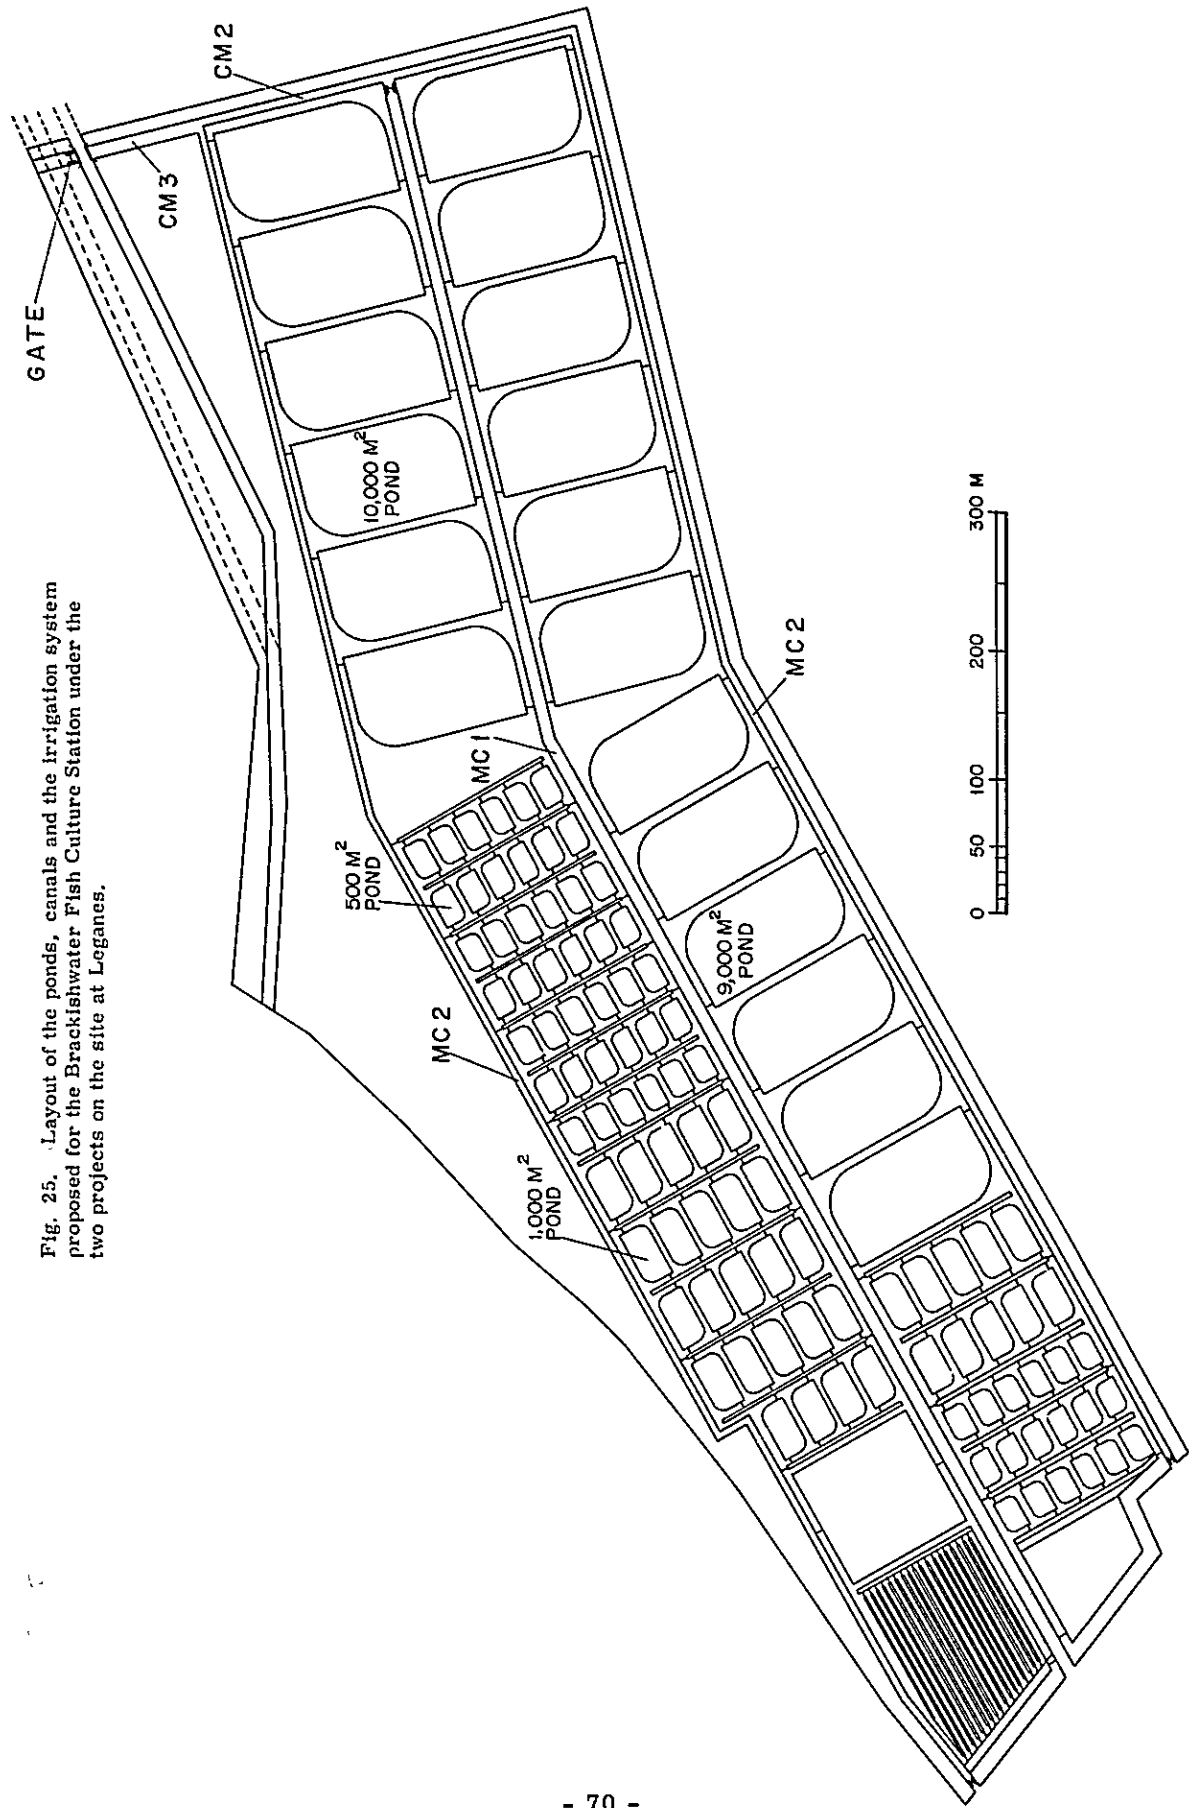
Layout of the ponds, canals and the irrigation system proposed for the Brackishwater Fish Culture Station under the two projects on the site at Leganes.
